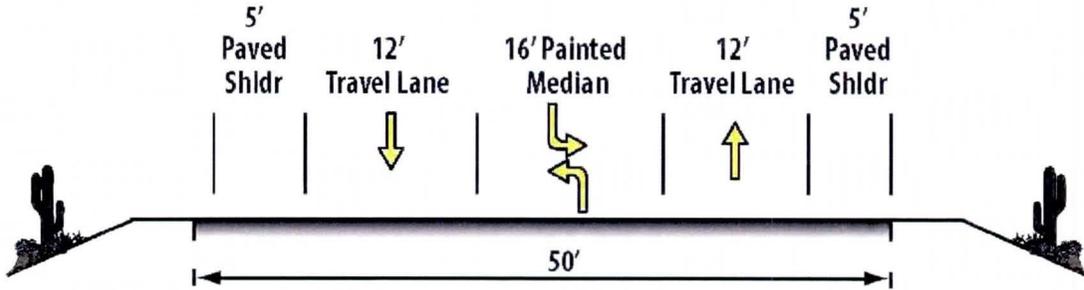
Interim Cross Section: Lost Dutchman Boulevard to Germann Road
